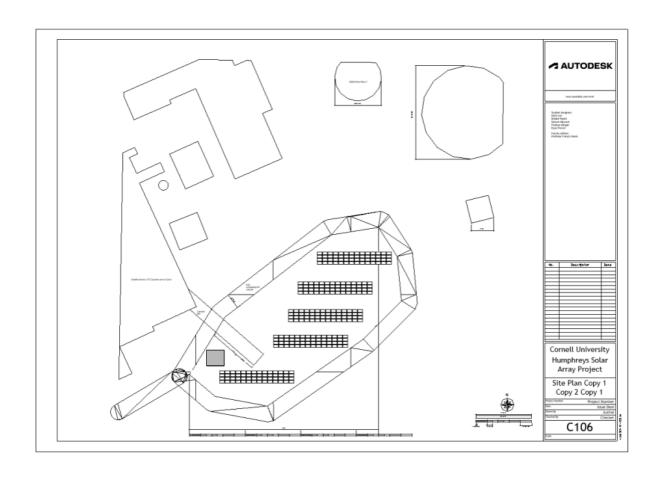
Revit of Proposed Solar Array Layout: Rack-Mounted
